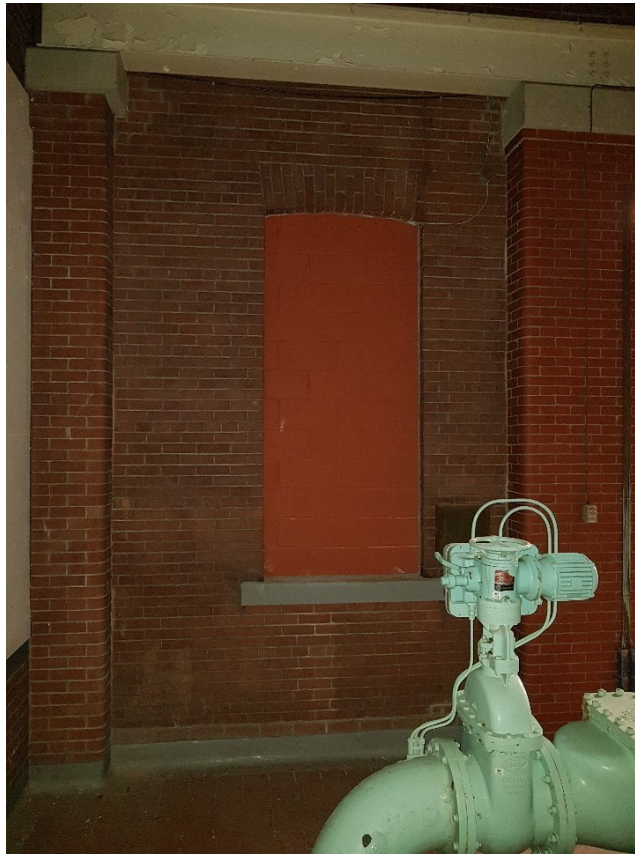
Surviving bay and window of the south wall as seen from inside the 1929-30 Extension.
